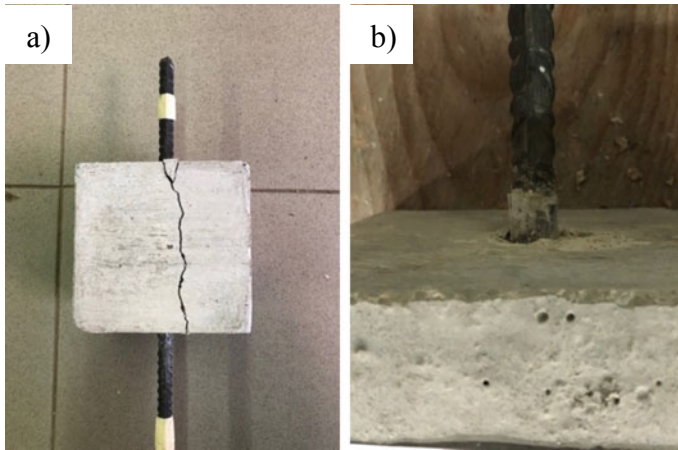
a Concrete splitting failure and b pull-out failure after test
